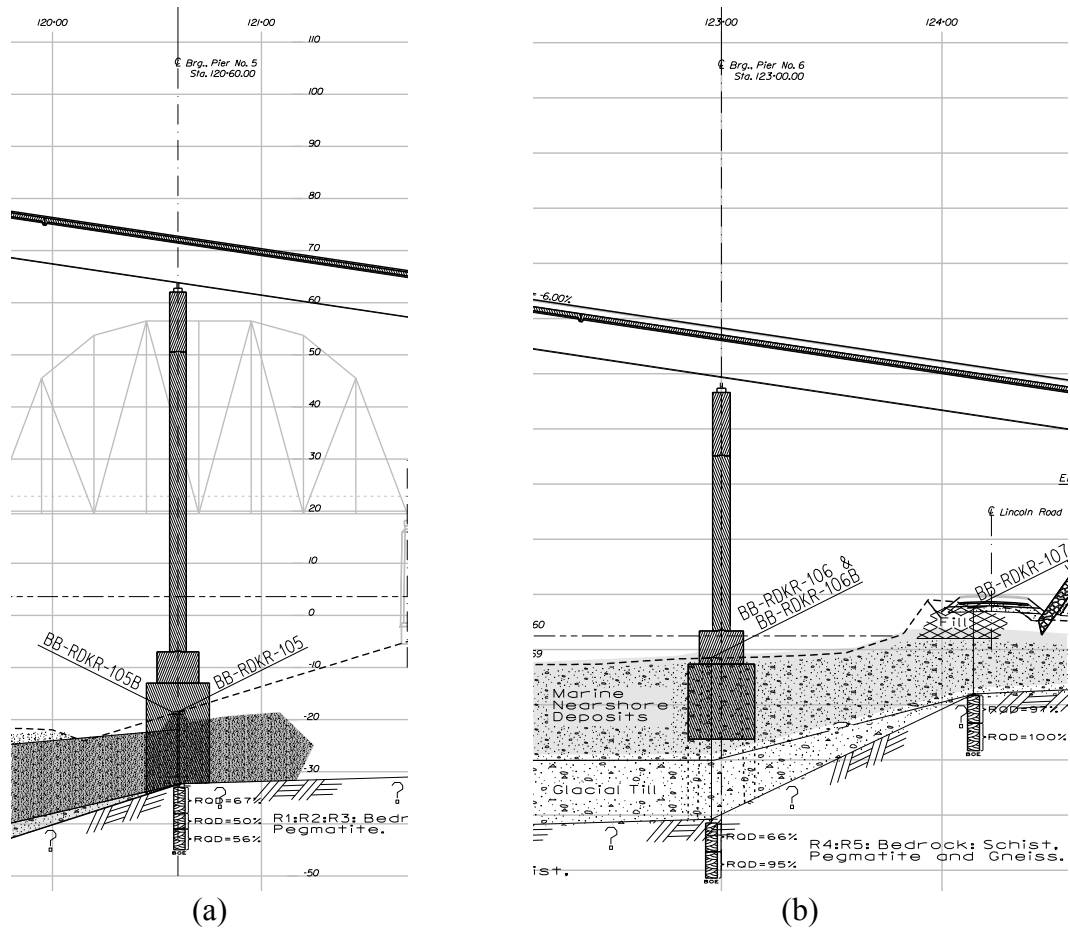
Soil Conditions at Pier 5 (a) and Pier 6 (b) of Proposed Bridge
